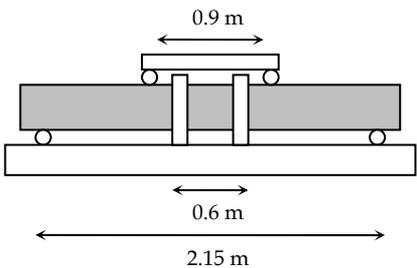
(left) Schematic overview of test setup for 1:8 scale models of 18 m beam
